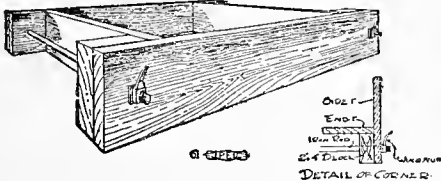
Form for Casting Concrete Slabs for Simple Sidewalks.
